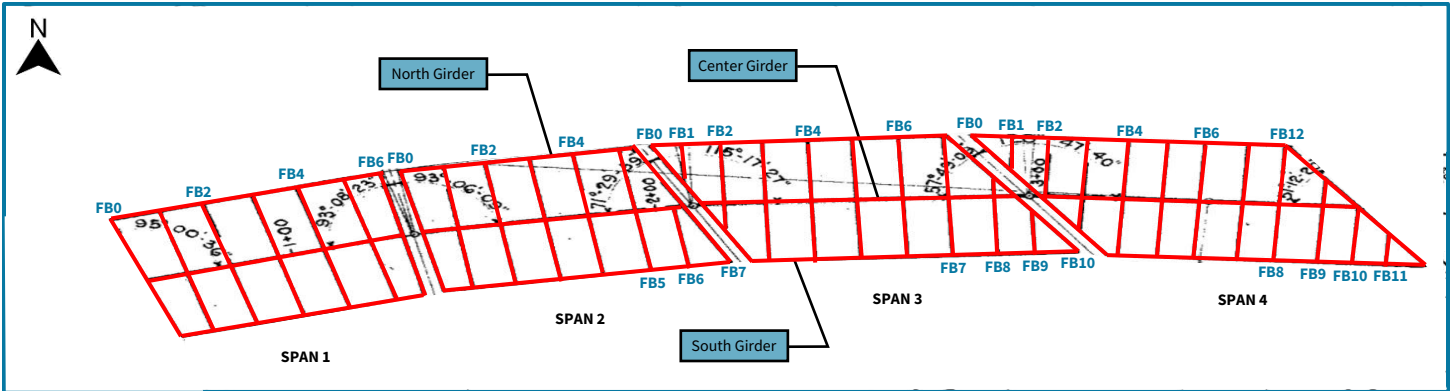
HAM-50-2180N Bridge Nomenclature (Framing Plan Layout and NSTMs - Spans 1 to 4)
